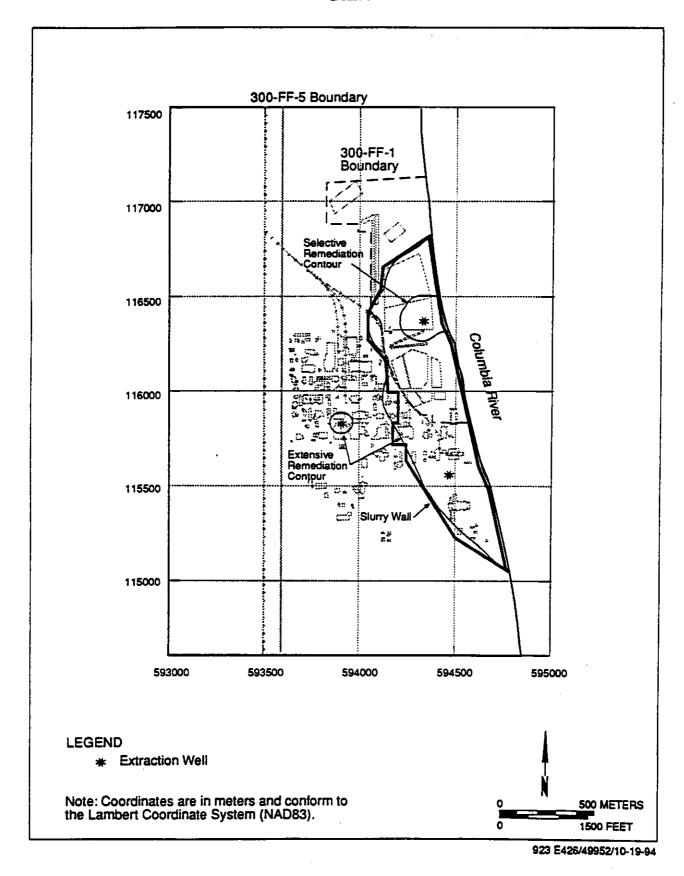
Layout for Extensive Slurry Wall Containment.
